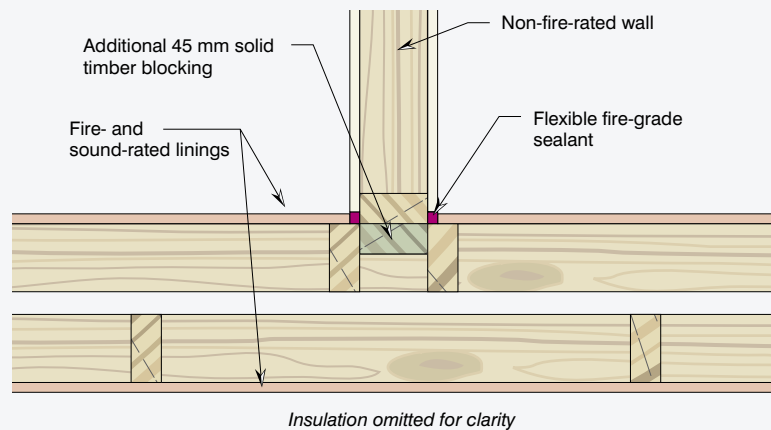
Junction between fire-rated and non-fire-rated and/or lower fire-rated wall – plan view.
